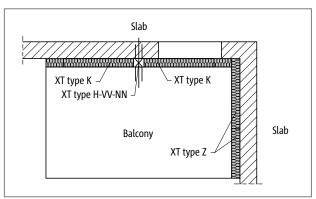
Schöck Isokorb® XT type H: Balcony freely cantilevered
